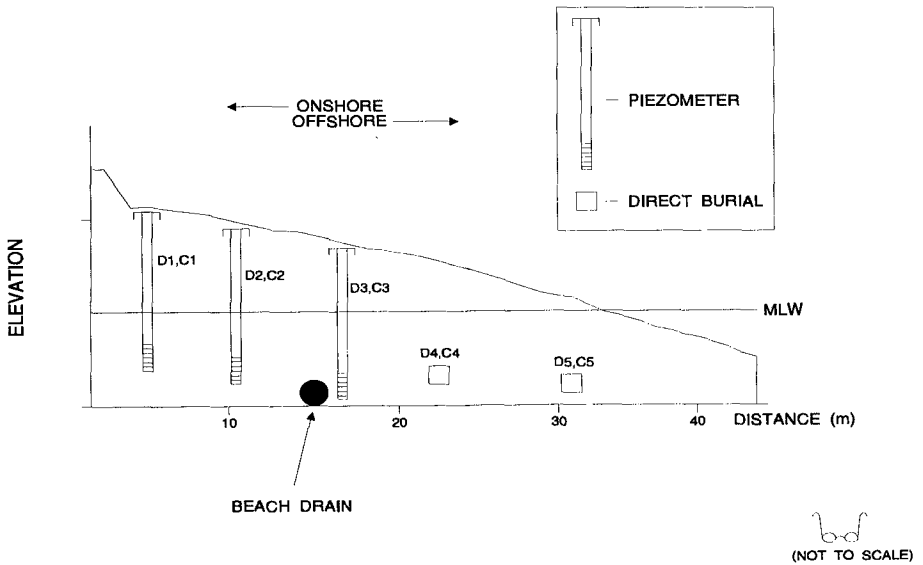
Cross-sectional schematic of the groundwater monitoring installation at Codfish Park STABEACH segment and adjacent control beach.
